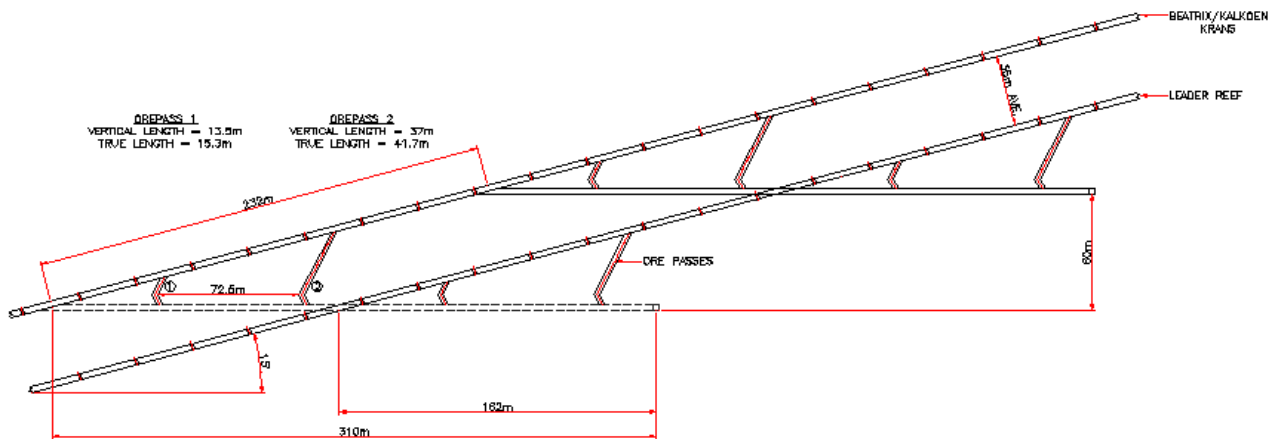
SECTION THROUGH STOPE SHOWING STOPE ORE PASSES CONNECTING TO CROSSCUT DEVELOPMENT
